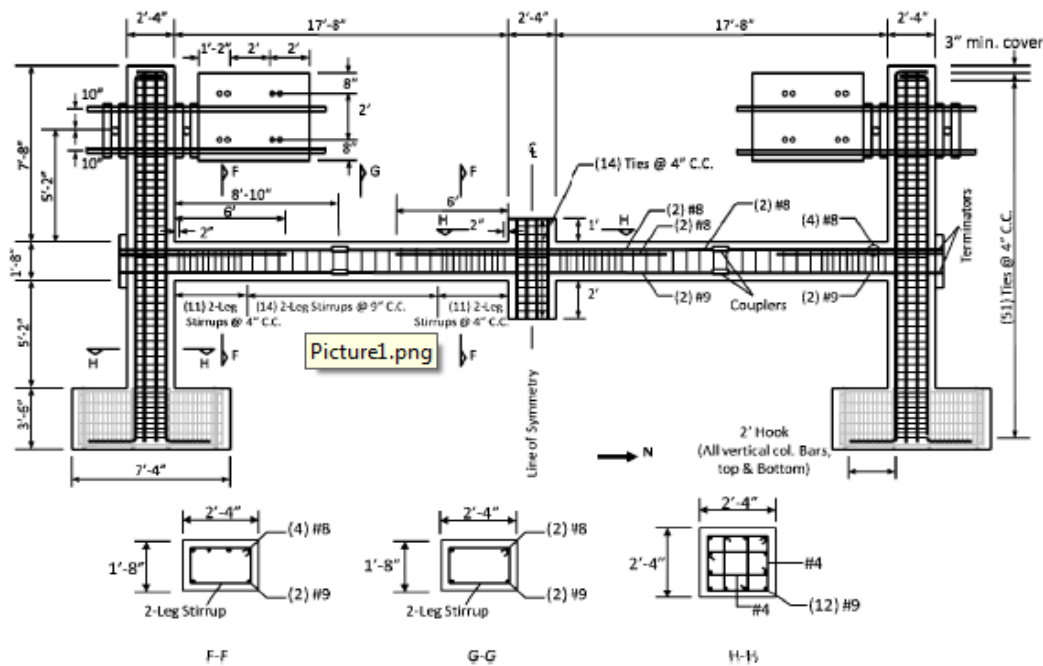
Geometric and reinforcement details for IMF specimen (Lew et al. 2014)
